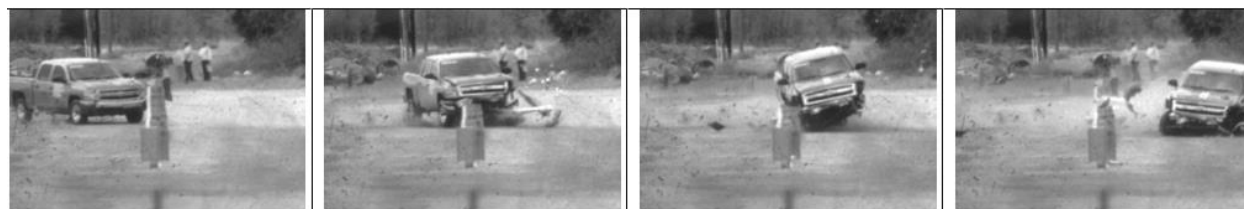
Sequential views of full-scale crash Test RF476460-1-5.[*Bullard10*]
